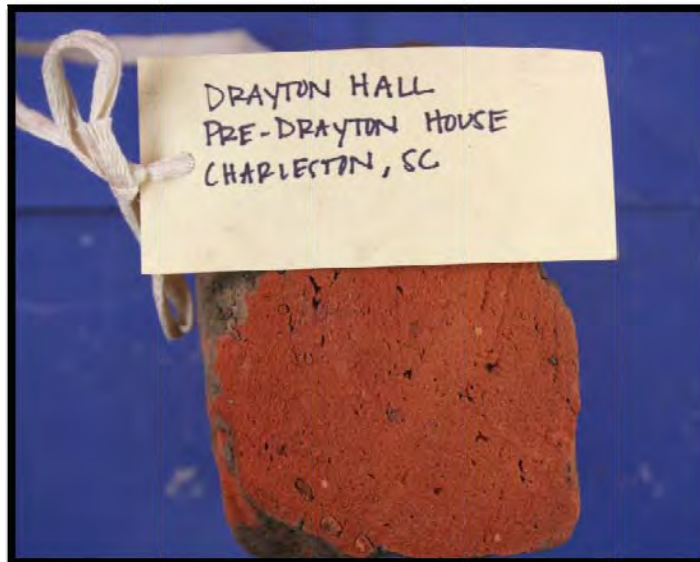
Brick sample from the Pre-Drayton house located under the northwest corner of Drayton Hall. From the collection at Drayton Hall Plantation. (Stephanie Hart)
